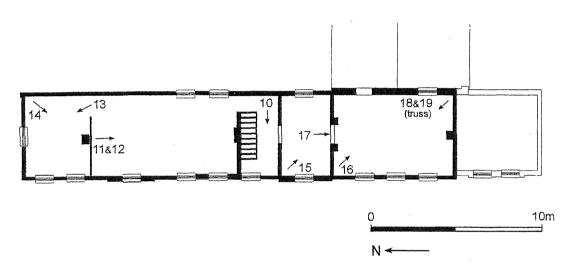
Direction of second floor photos (Based on original drawings by BLB Architects of Redditch
